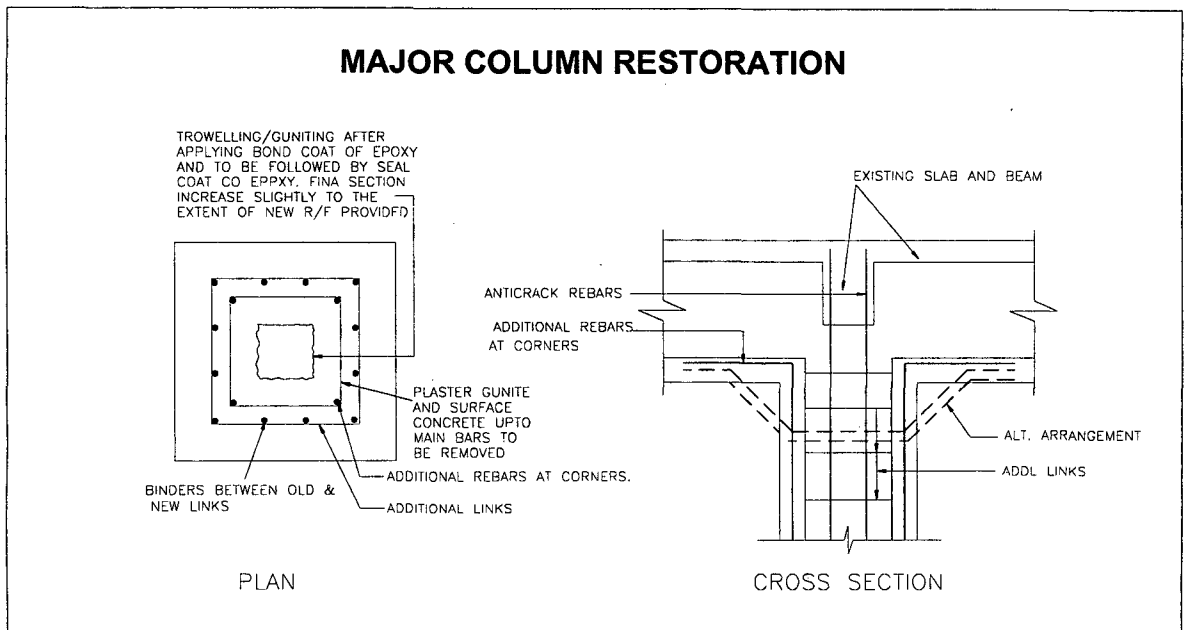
Column concrete damage is major and spread throughout, which needs encased cross-sectional provisions. Usual popping is prerequisite before prerequisite for static stability. Repairs are carried out as shown including improvements to column beam junctions.
